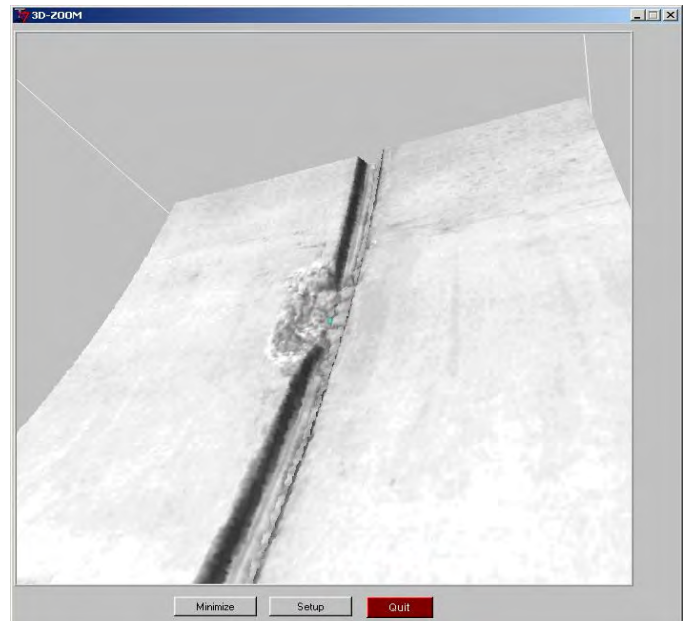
3-D view of concrete surface in tunnel with damage (chip-off) near the joint of two sections.
